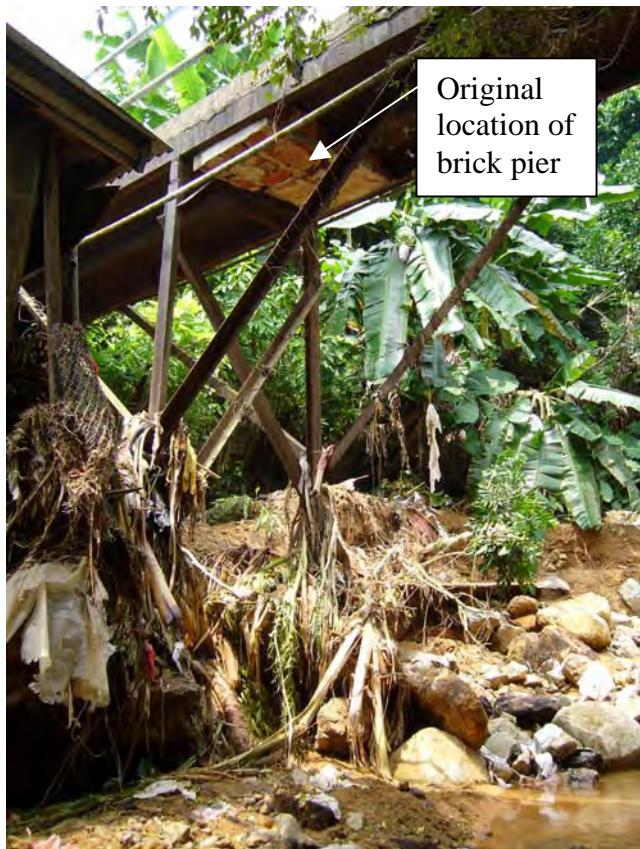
Original Location of Destroyed Cement-Rendered Brick Pier Providing Partial Support to Footbridge across Streamcourse
